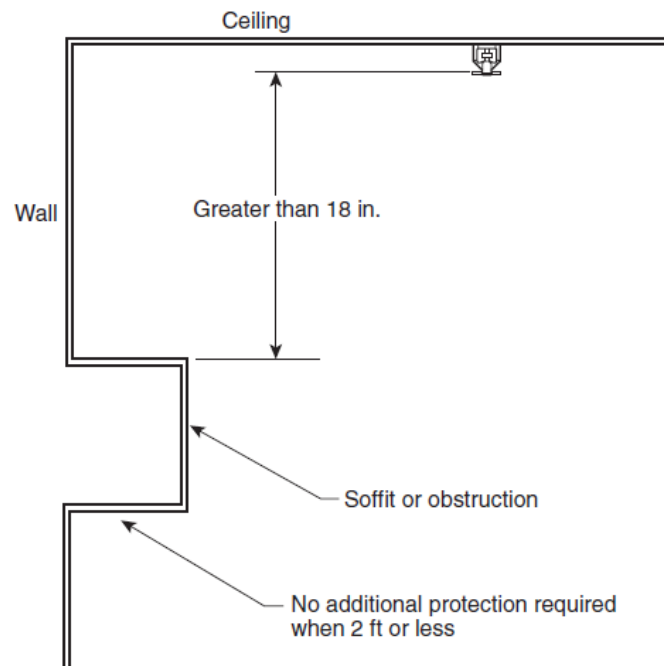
Soffit/Obstruction Against Wall Greater Than 18 in. (457 mm) Below Deflector.
